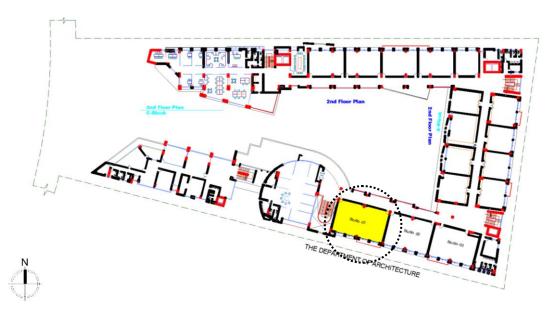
2nd floor plan of AUST showing the case studio (Circled)
